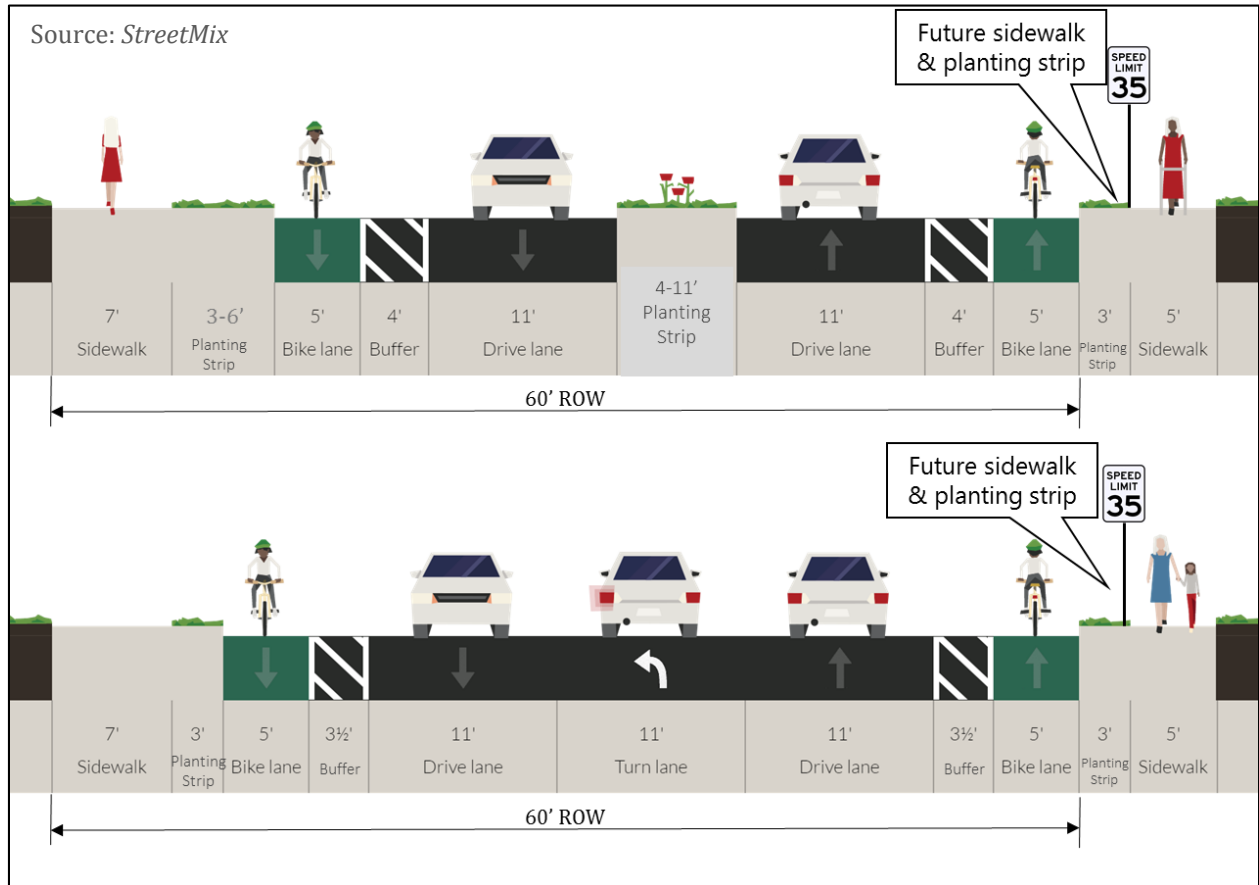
SR 28 Roadway Typical Sections - 60' ROW Alternatives
